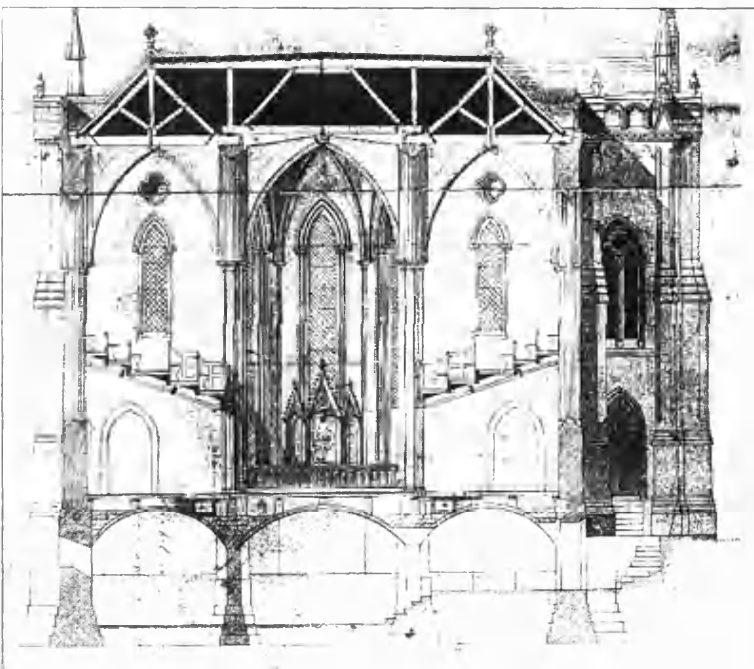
St. Michael's Church. 'Transverse section looking North' showing undercroft vaulting, and galleries. Signed G.P. Manners, Sept. 8th., 1834 Contract drawing. • Biggs 5204.
